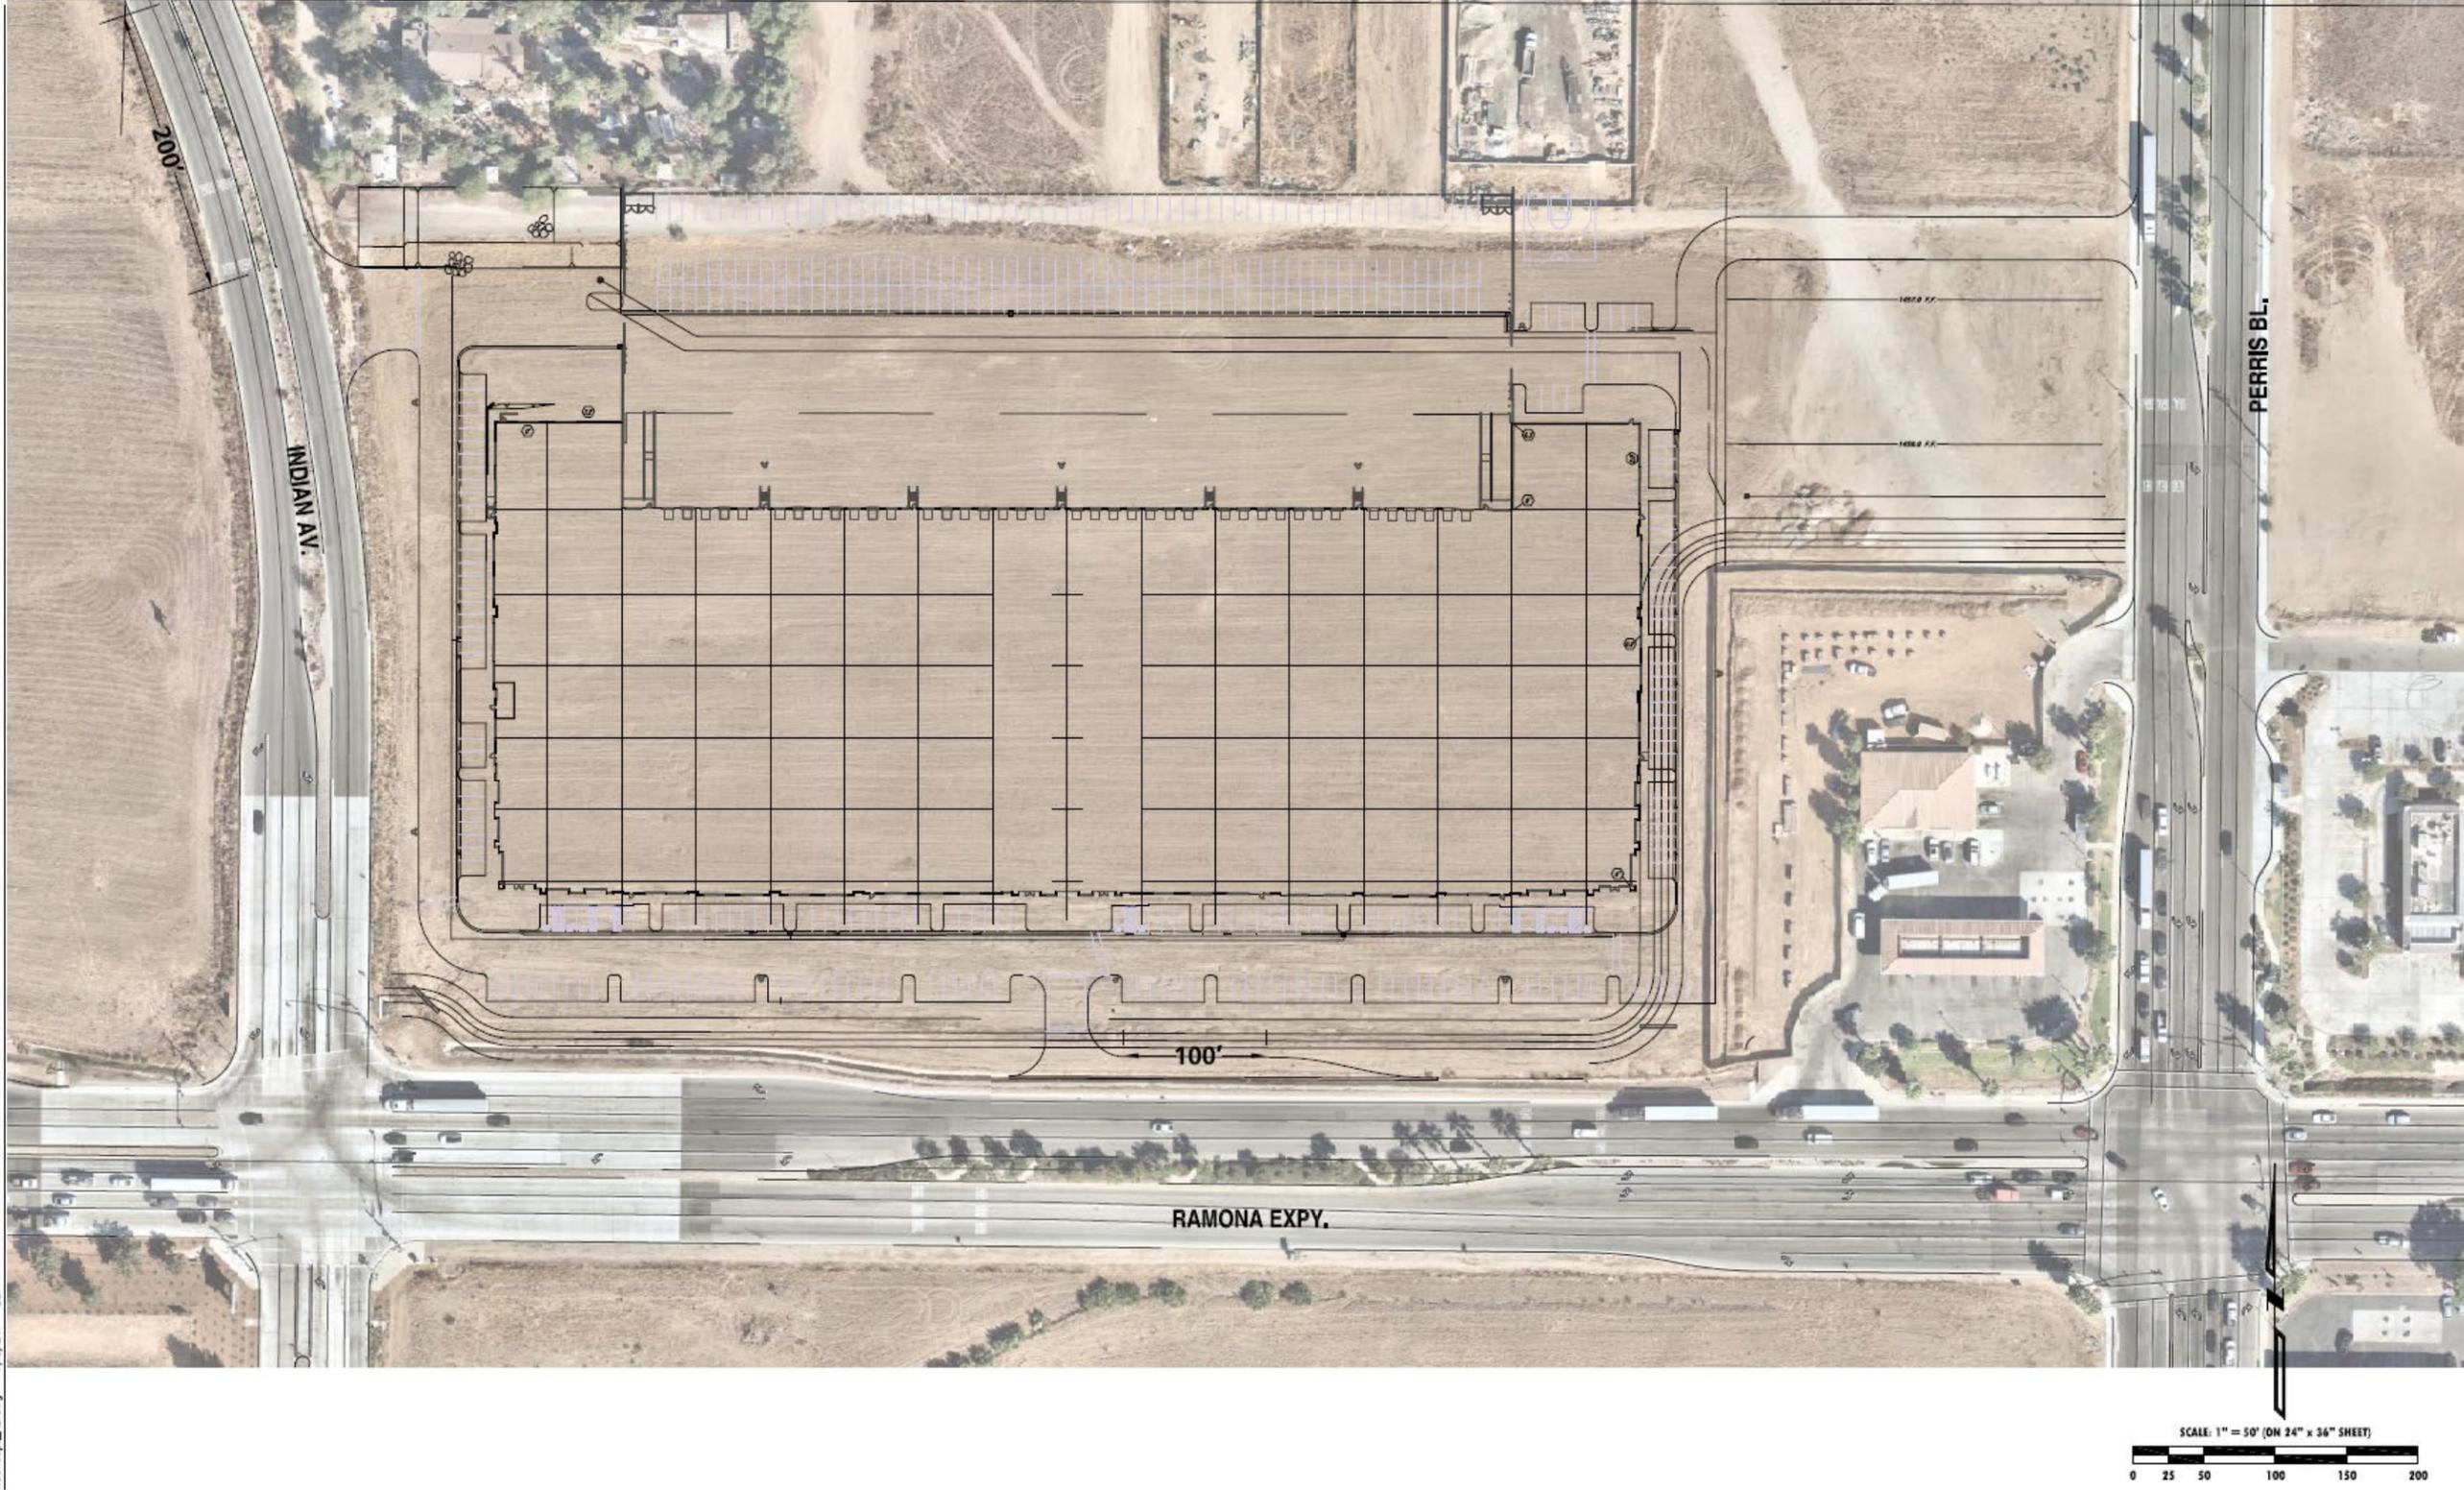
SITE ACCESS RECOMMENDATIONS
